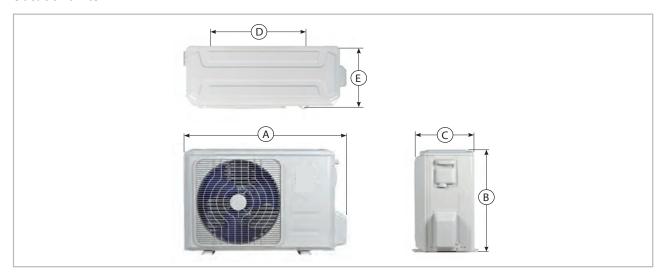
Outdoor unit dimensions BL 263-353 DC AT
